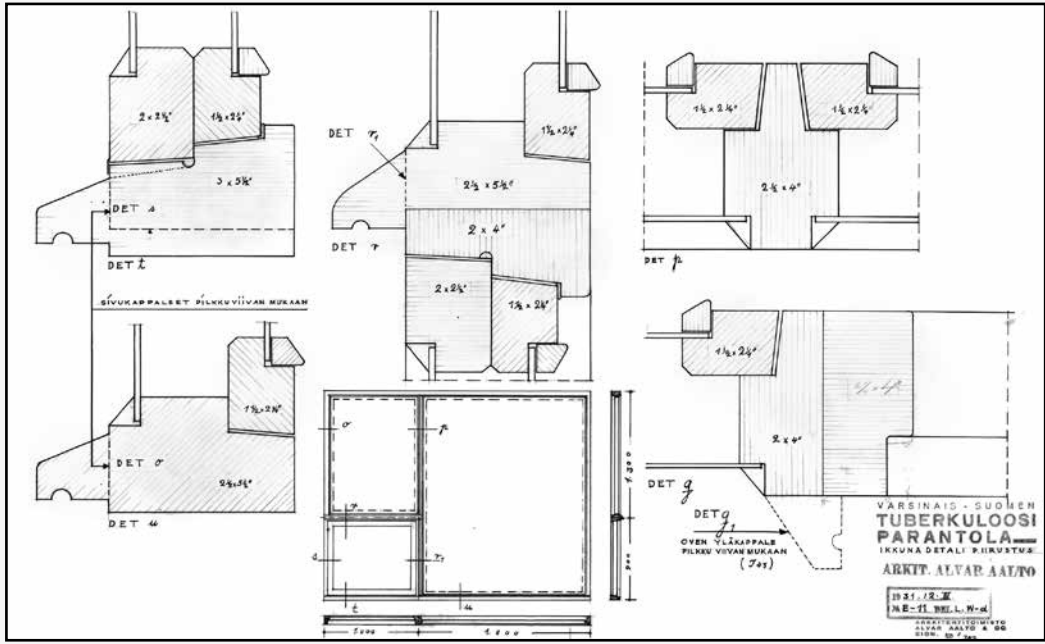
The image presented a double-glazed wooden window with the two opening casements coupled. The outer window was fixed to the frame with putty and the inner casement was a wooden one opening inwards. The fixed part was washable. Drawing No. 50-387. The drawing has been edited. AAM.
